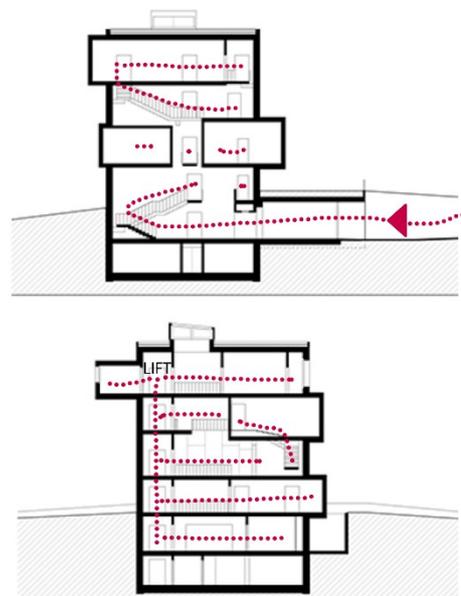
Kemes Volcano Park, Hungary: Sections. (Source: Floor plans by Foldes Architects with markings by Filová, 2021)
